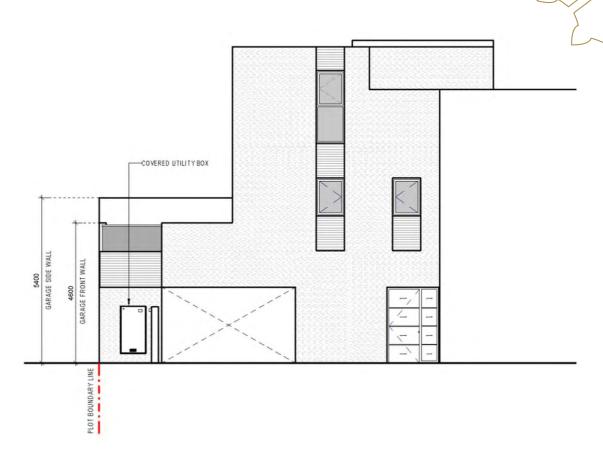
Right Elevation (Roadside) showing boundary wall and entrance for Villa 3.3 / Sabaah
